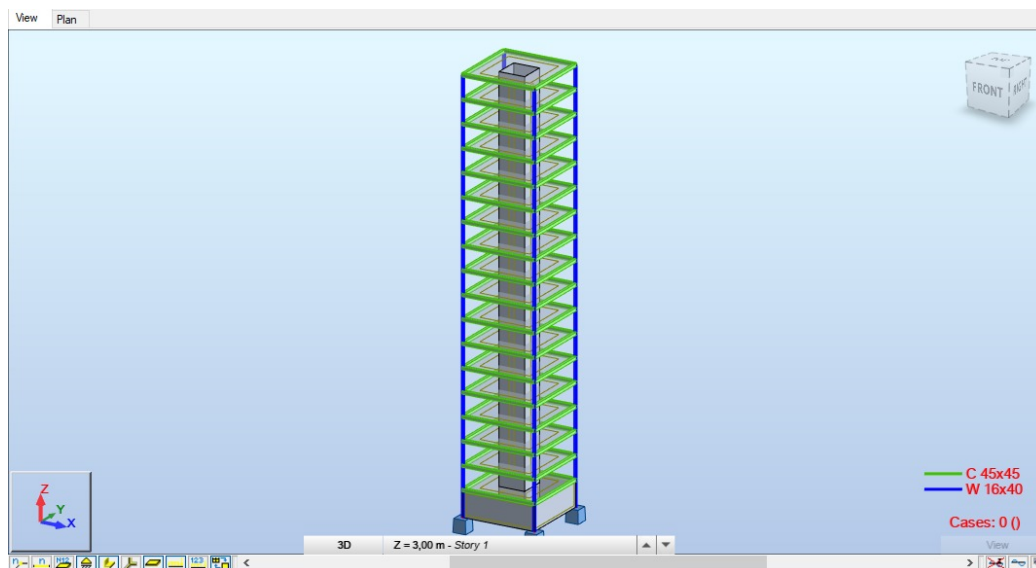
Test building modeled in Dynamo. Adapted from [6]
